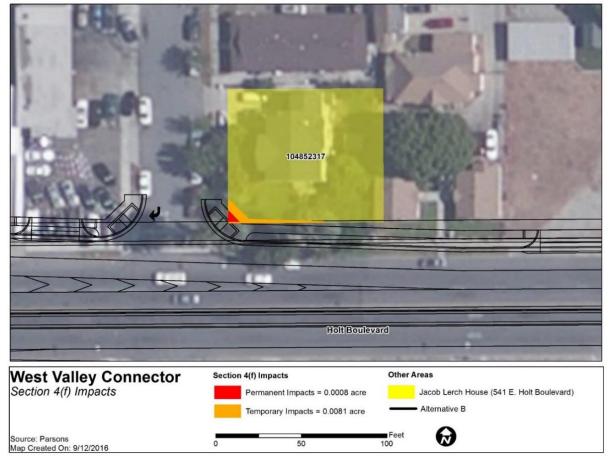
Alternate B Impacts to Jacob Lerch House
